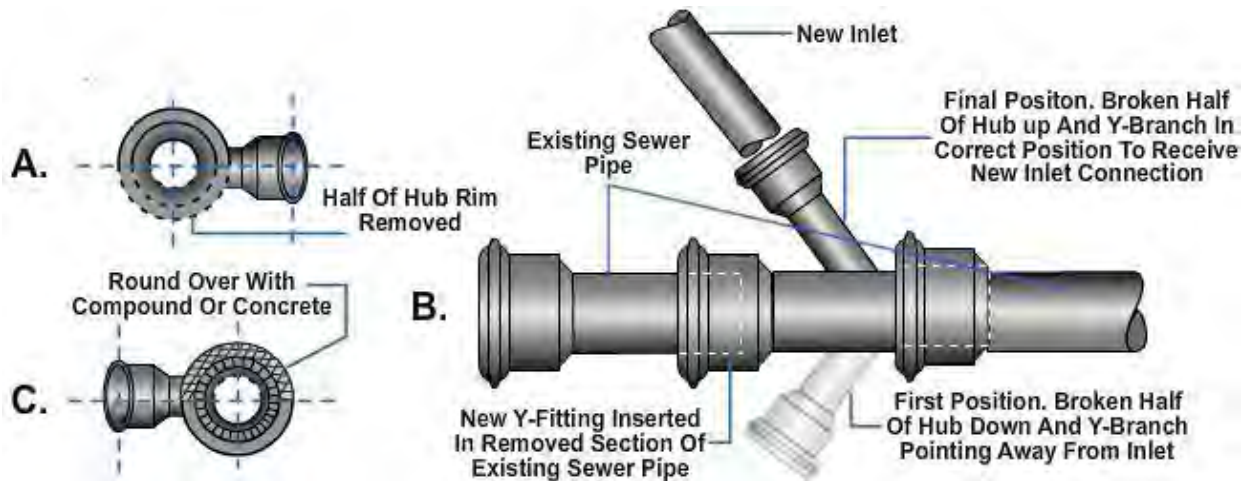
Adding connections to an outside vitrified clay sewer pipe.
